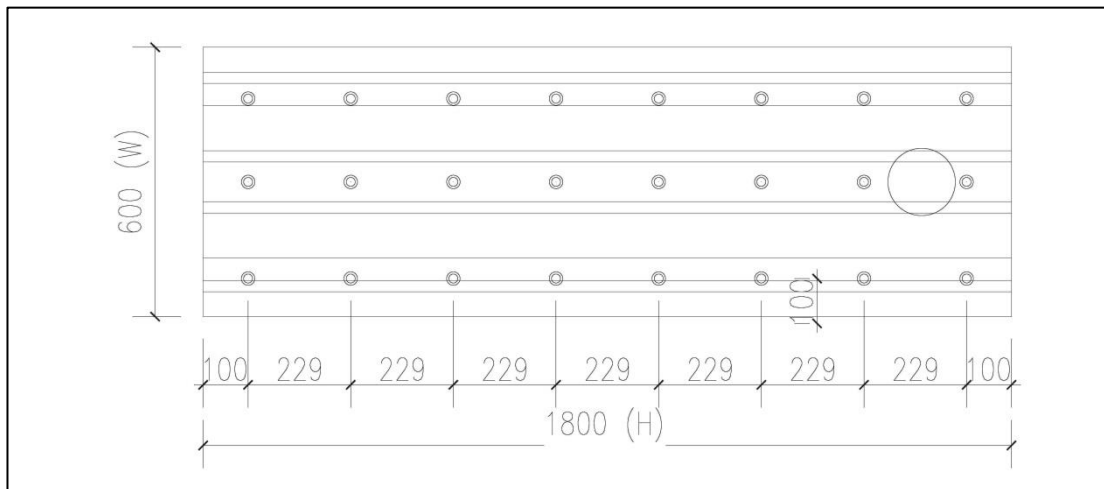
Frontal elevation of vertical unit shows the used temperature sensor locations inside the plenum
